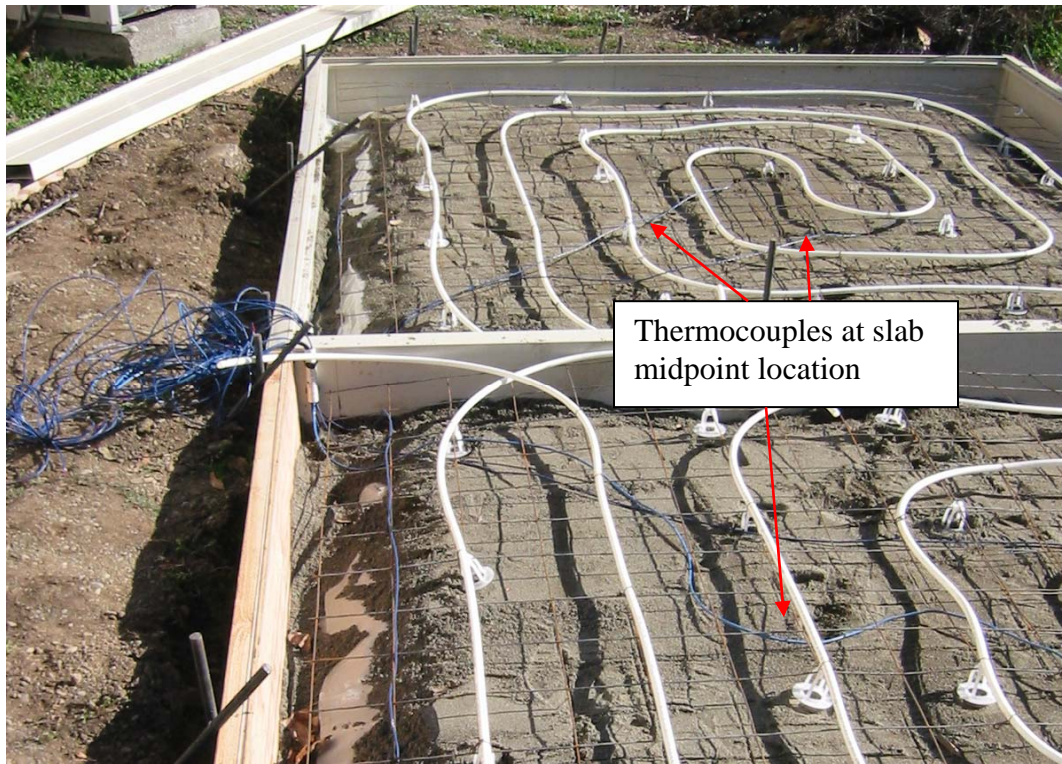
Hydronic PEX Tubing and Slab Thermocouple Installation
